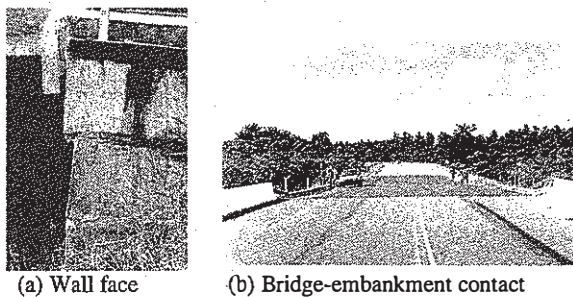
Damages to a reinforced abutment caused by foundation settlements (Fahel 1998).
